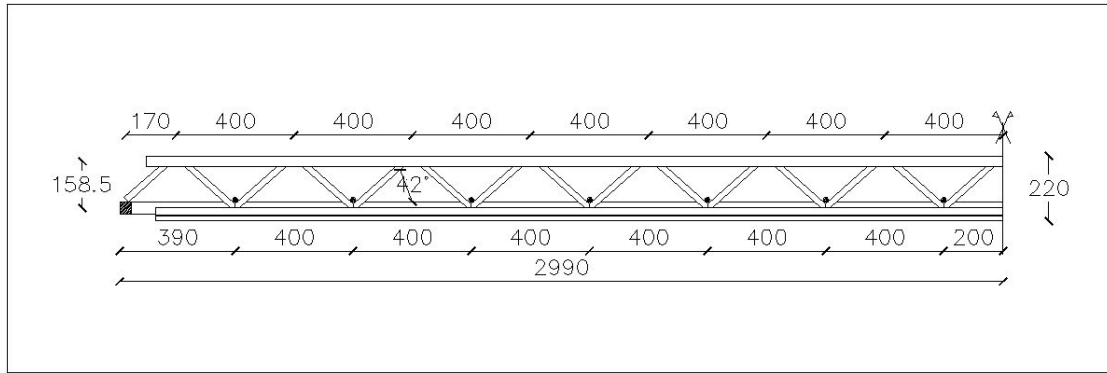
ECOTRAVE® RAFTILE® truss profile of beams 101
